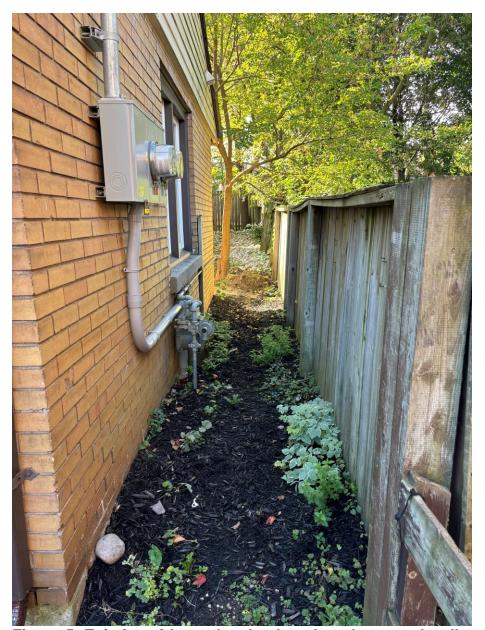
Existing side yard setback and unobstructed walkway to additional dwelling unit (detached).
